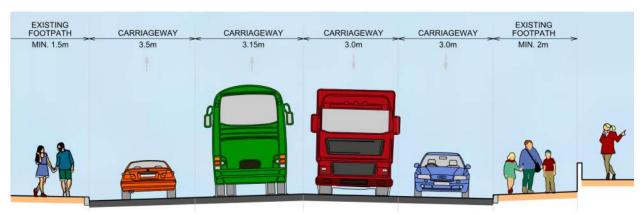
Existing Typical Cross Section Lower Mallow St
